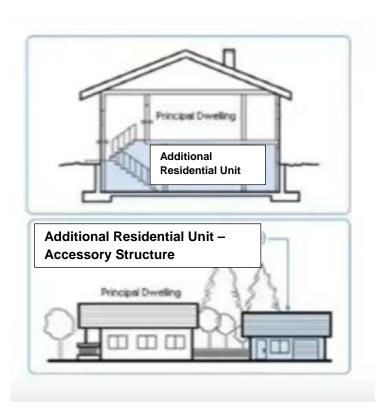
Additional Residential Unit - Basement and Accessory Structure
